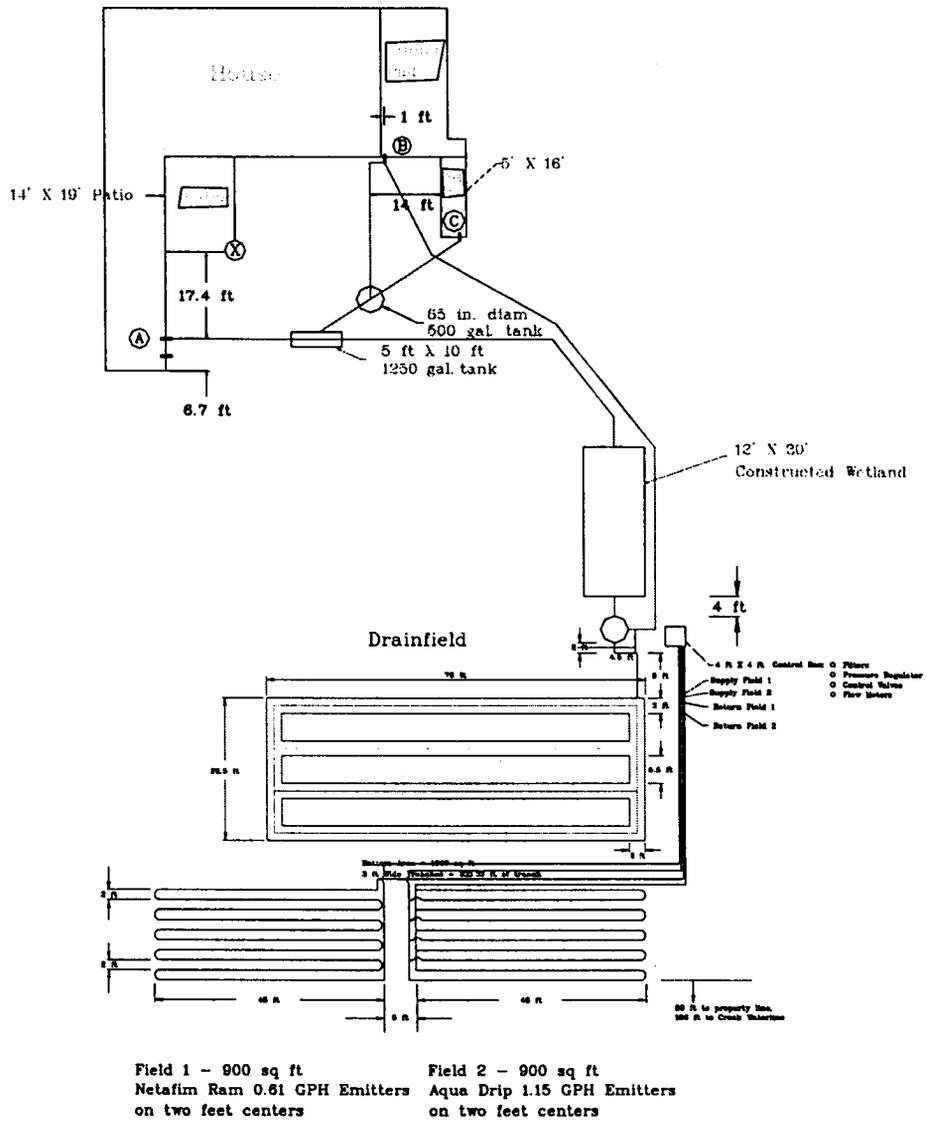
Drawing for site 3 on-site system located in Stephenville, Texas.
